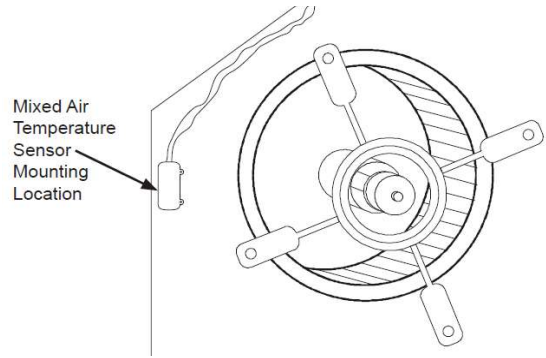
Typical MAT (SAT) Centrifugal Blower Location. If Probe or Eyelet Style Sensor, Install in Same Location
